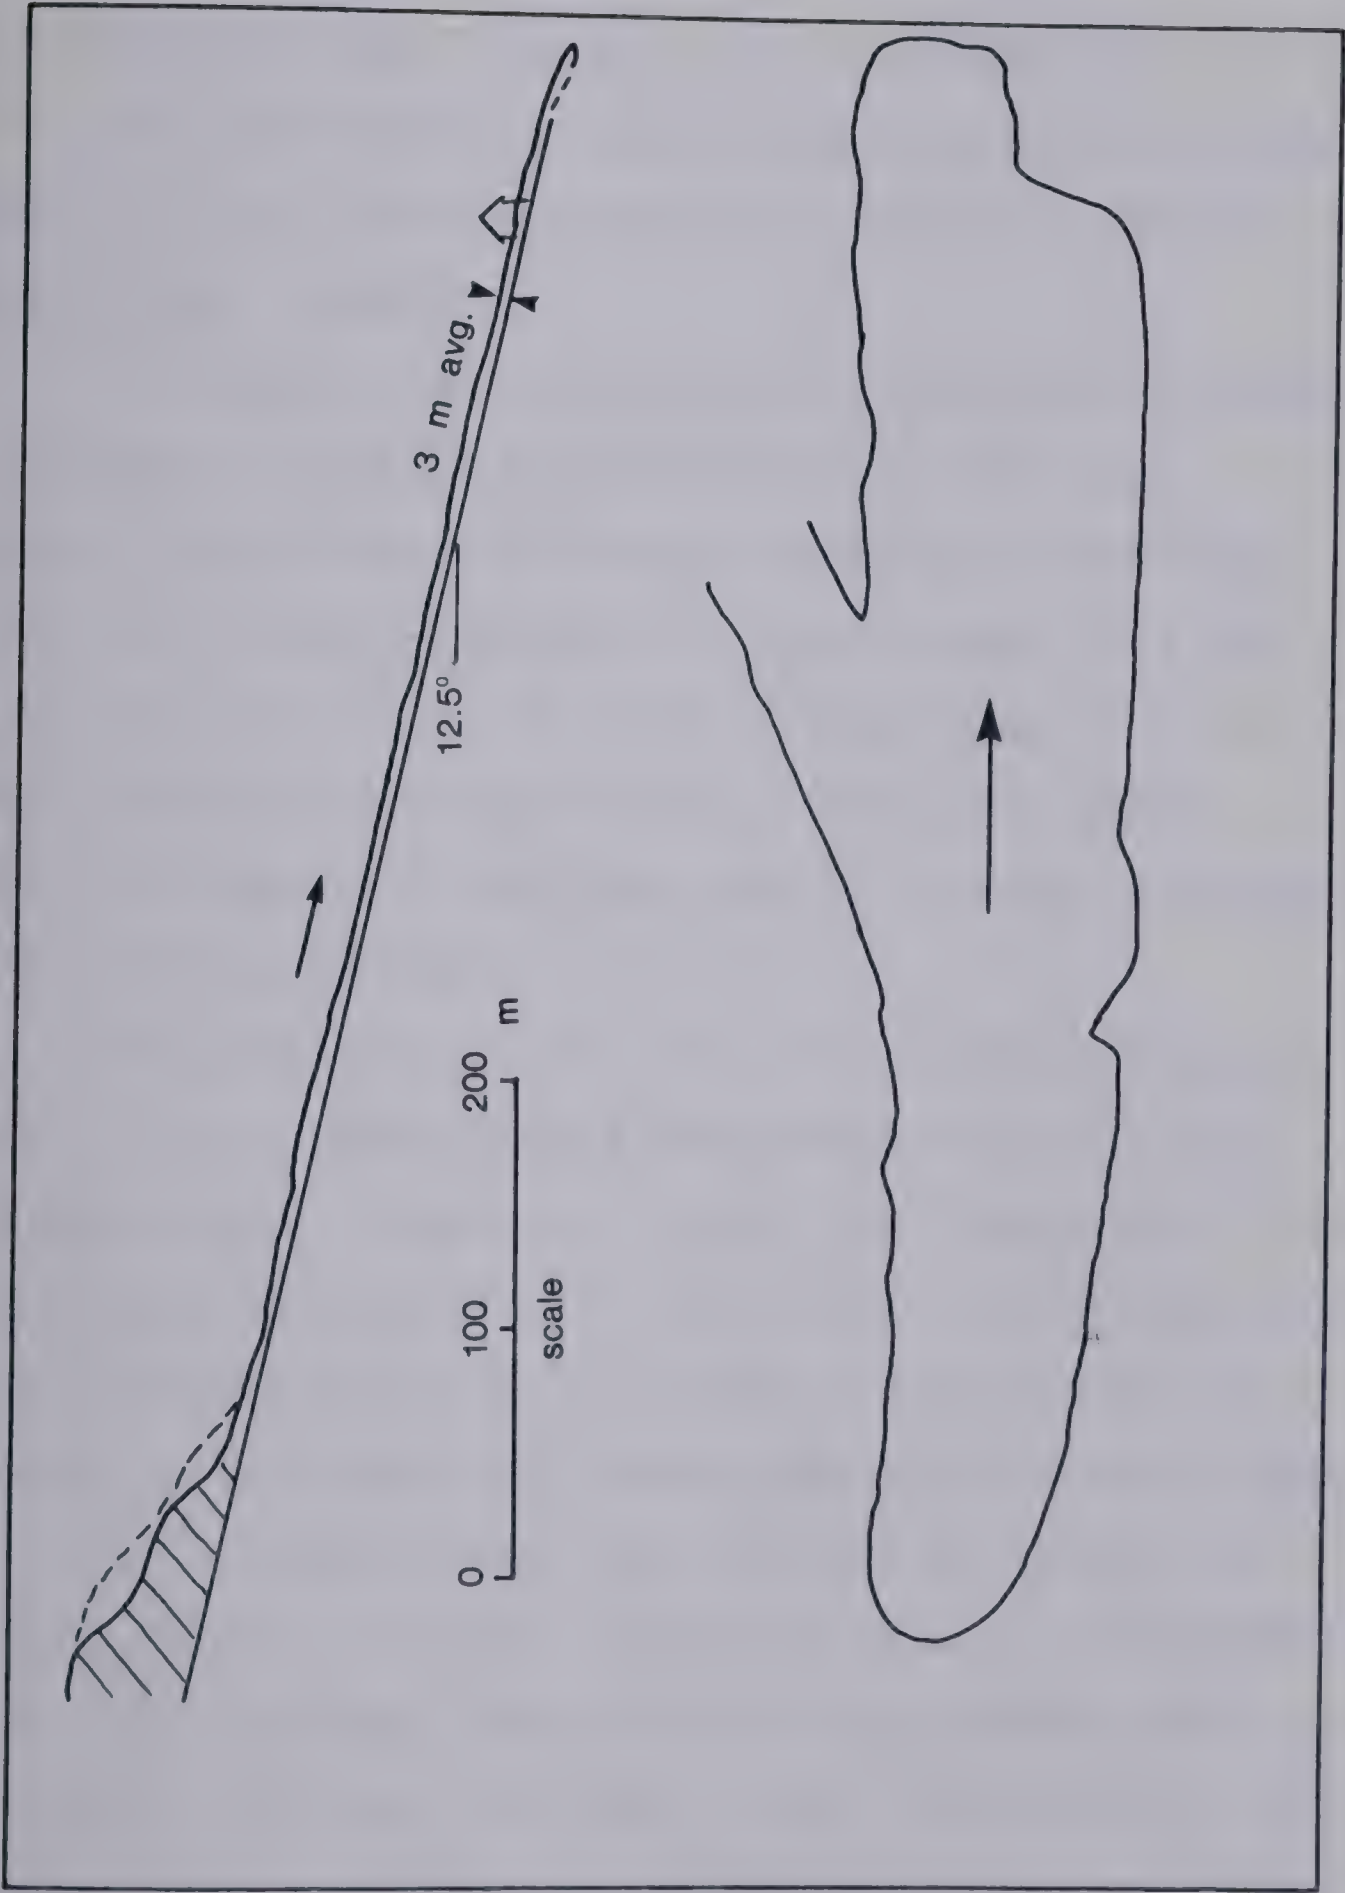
Plan and section of the Aberfan flow slide of 1966 (after Bishop, 1973).
